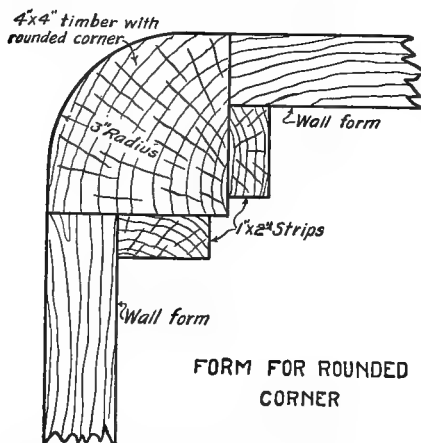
Form for rounding the inner corners of building walls. Rounded corners prevent the accumulation of dirt and simplify cleaning.
